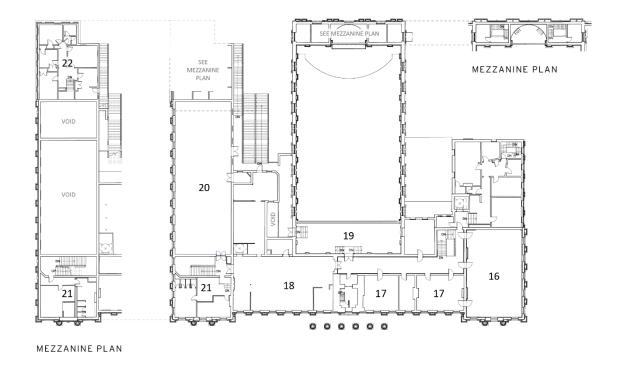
South Melbourne Town Hall, first floor plan: with key spaces/areas identified
